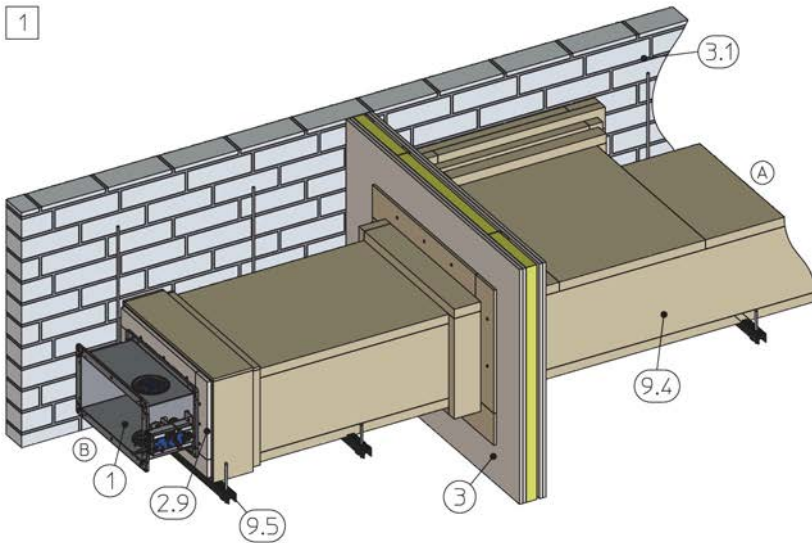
Dry mortarless installation with installation kit ES, remote from a solid wall (wall penetration)
